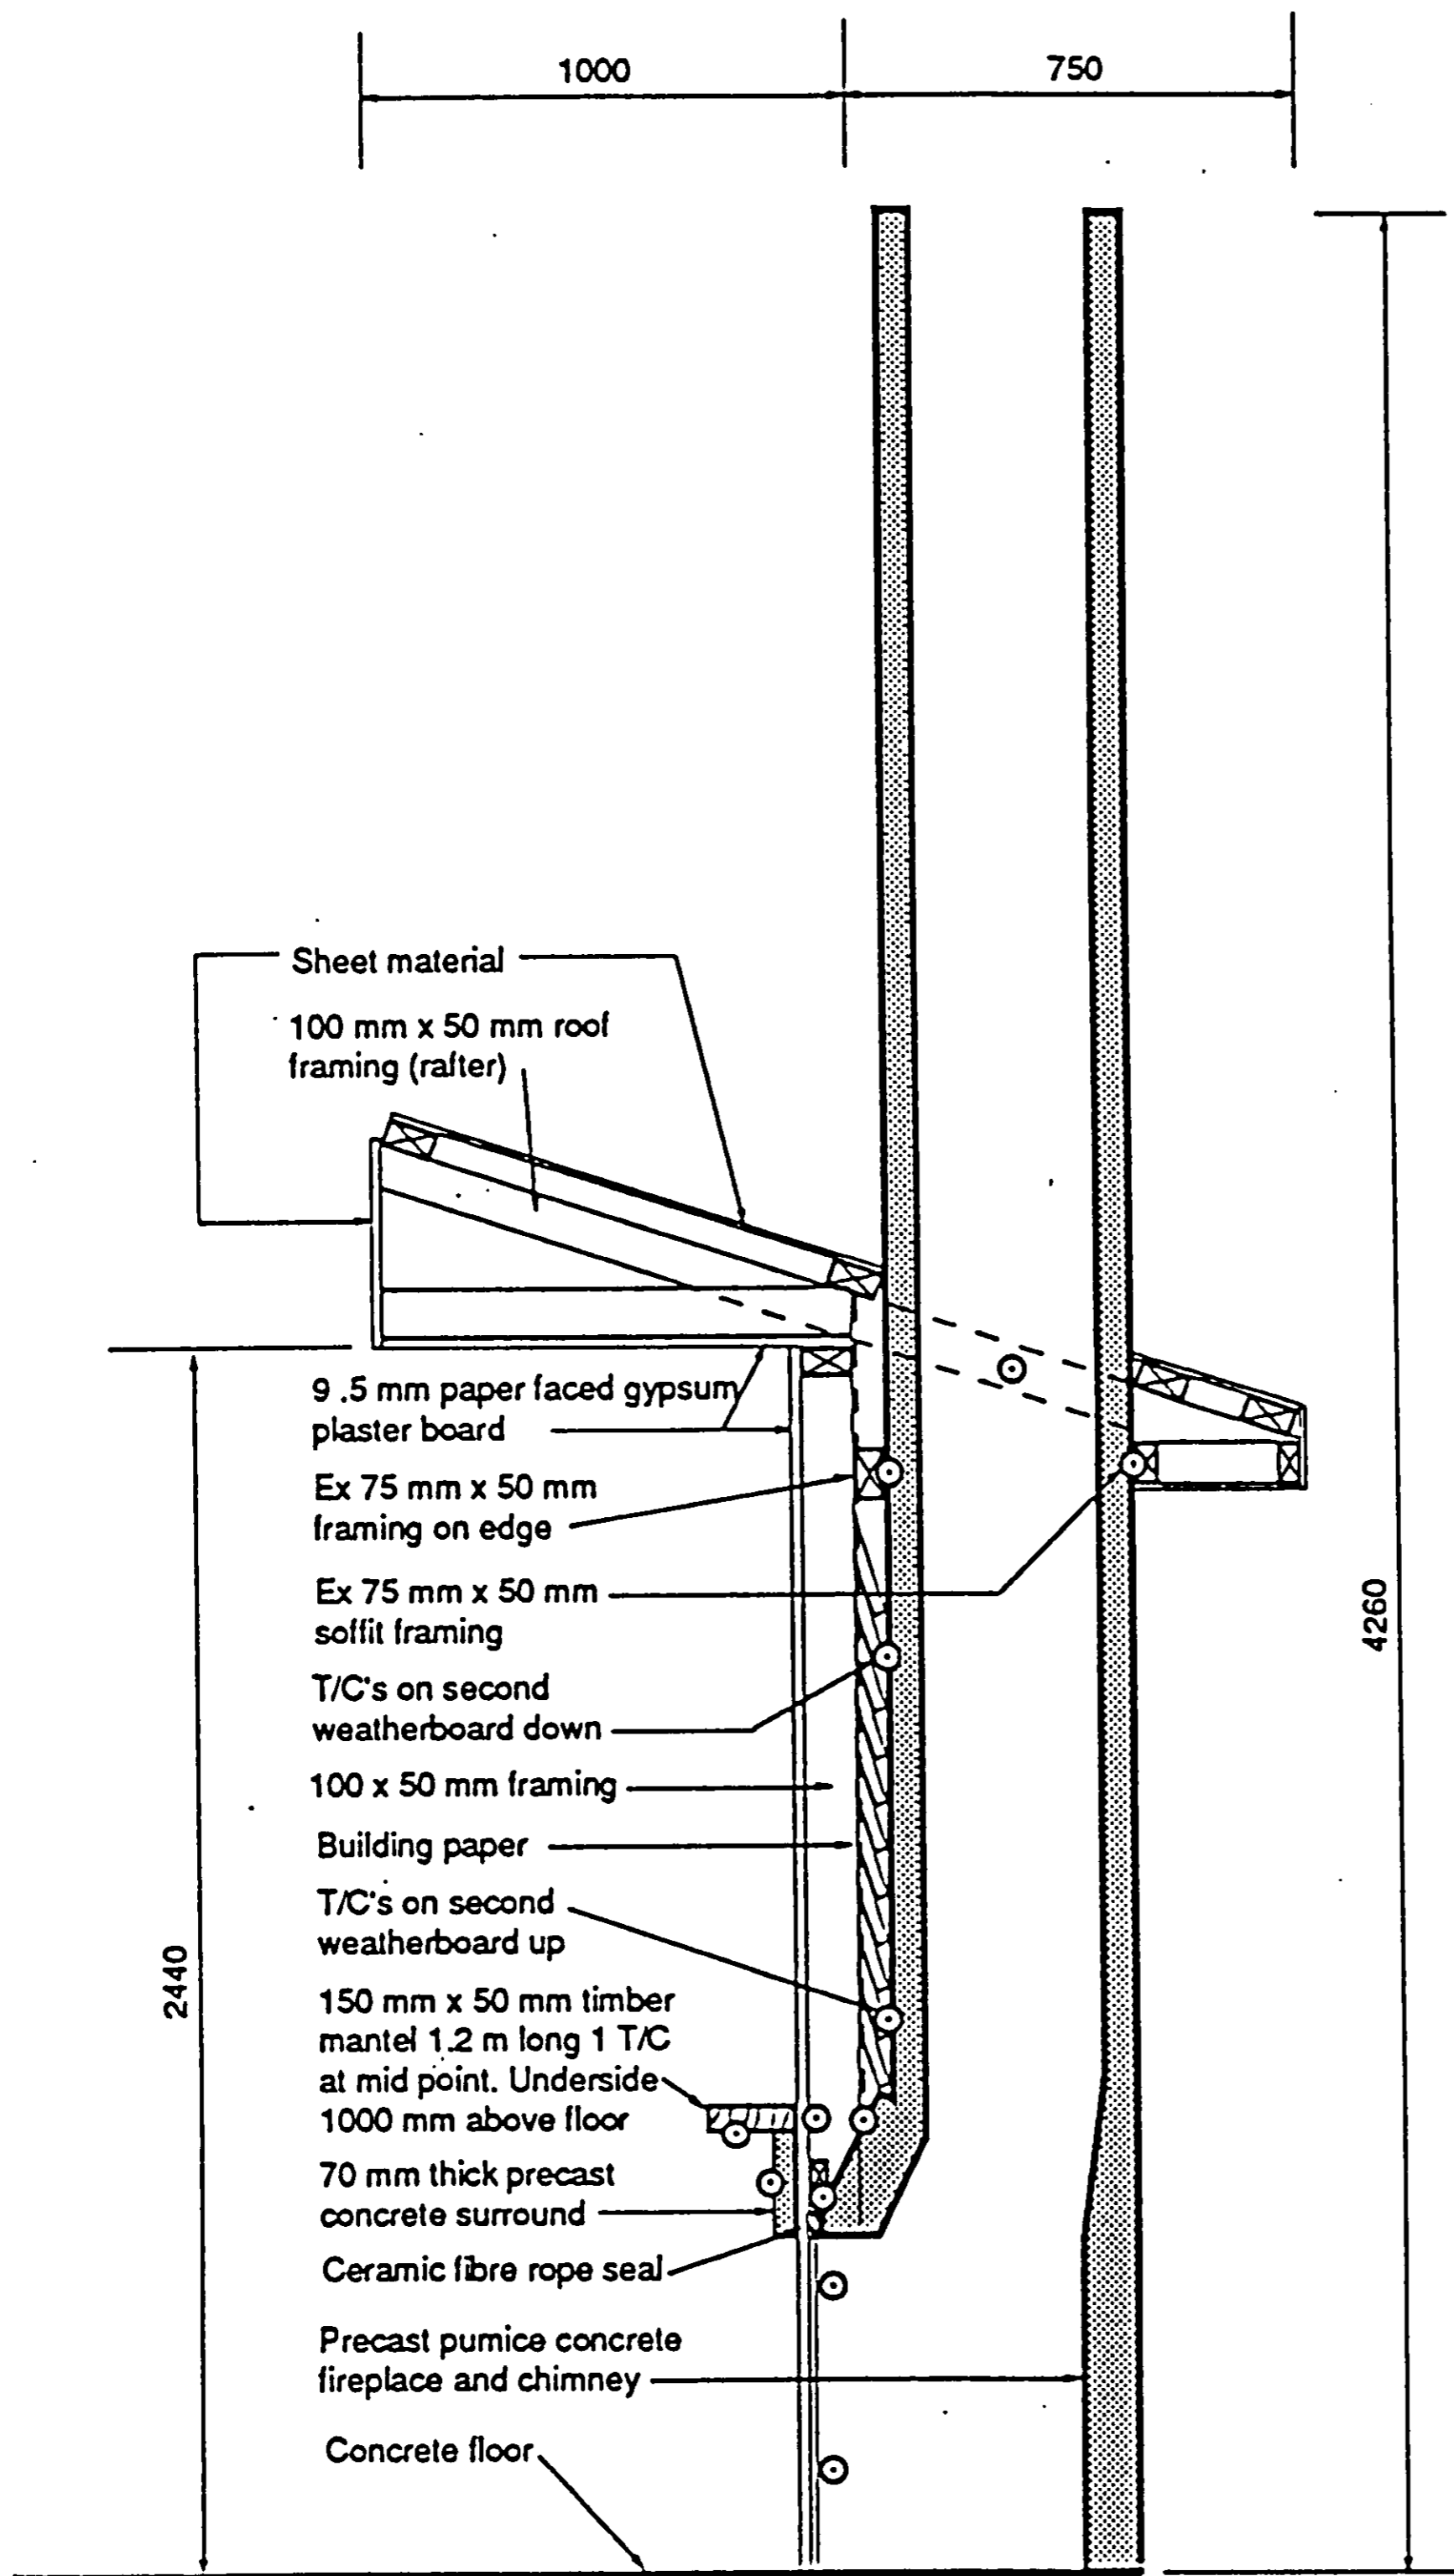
Elevation of Fireplace, Chimney, Framing and Thermocouple Arrangement
